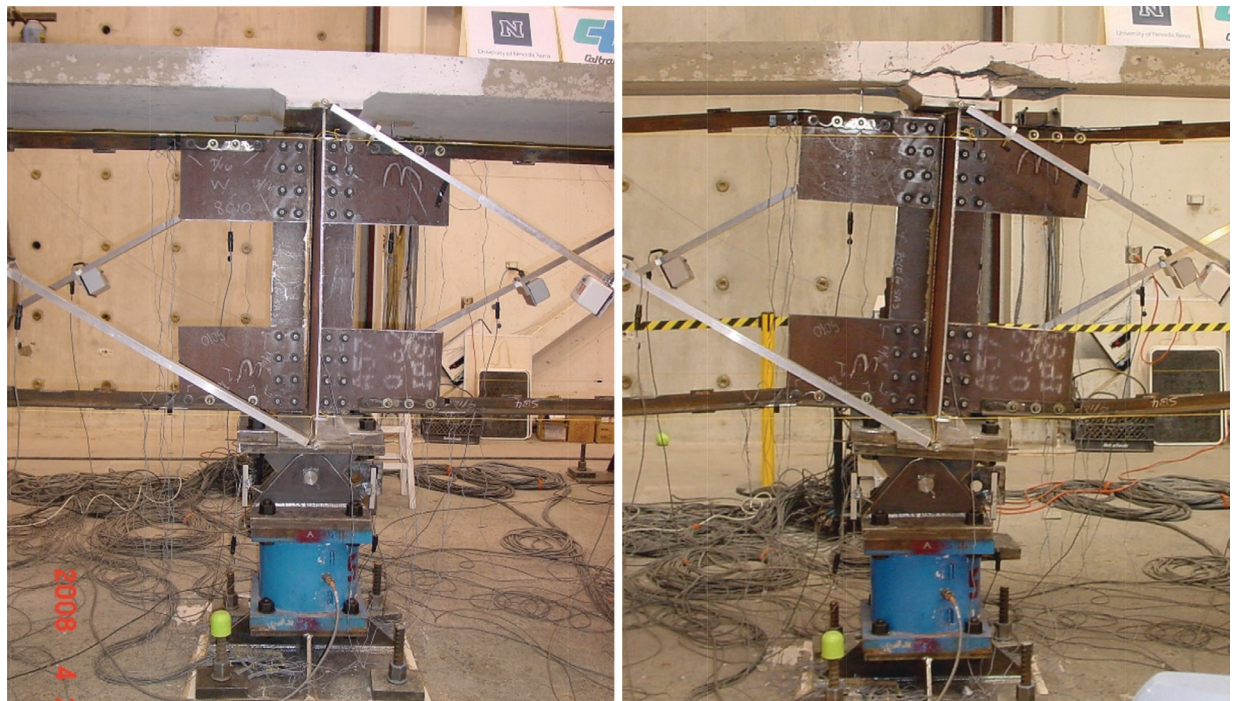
Specimen F0A: comparison of deformed and undeformed shape of middle girder (girder 2).
